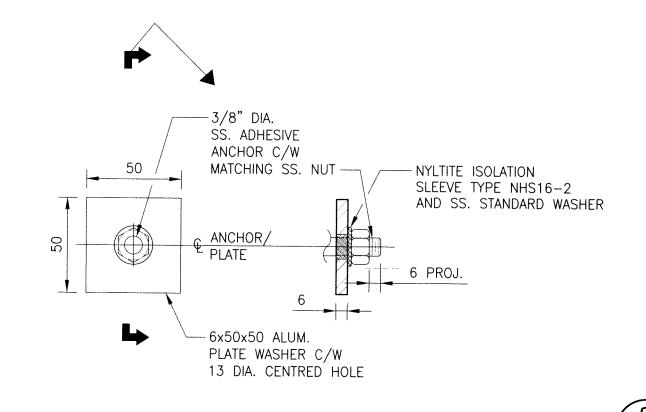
DETAIL - WEAR PLATE CORNER PORTION OF WALL (NEW) SCALE: 1:10
